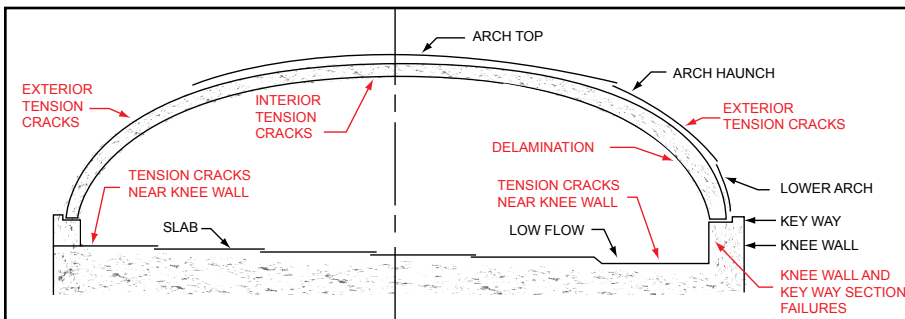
Key plan and damage map. The Duck Creek Culvert typical section. The precast concrete arch elements are placed on top of the knee walls, which were cast monolithically as part of the cast-in-place base slab.
